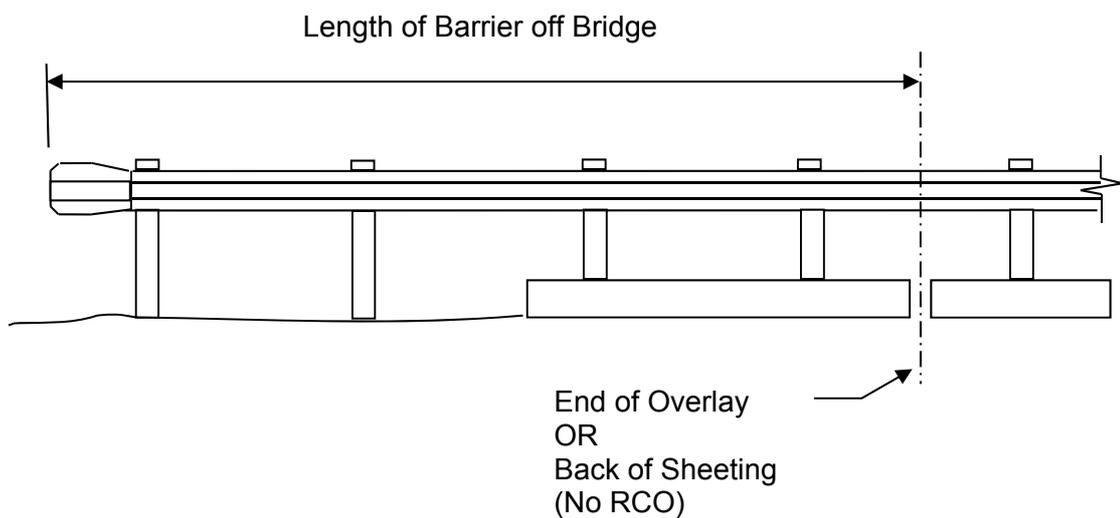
LENGTH OF BARRIER OFF BRIDGE
